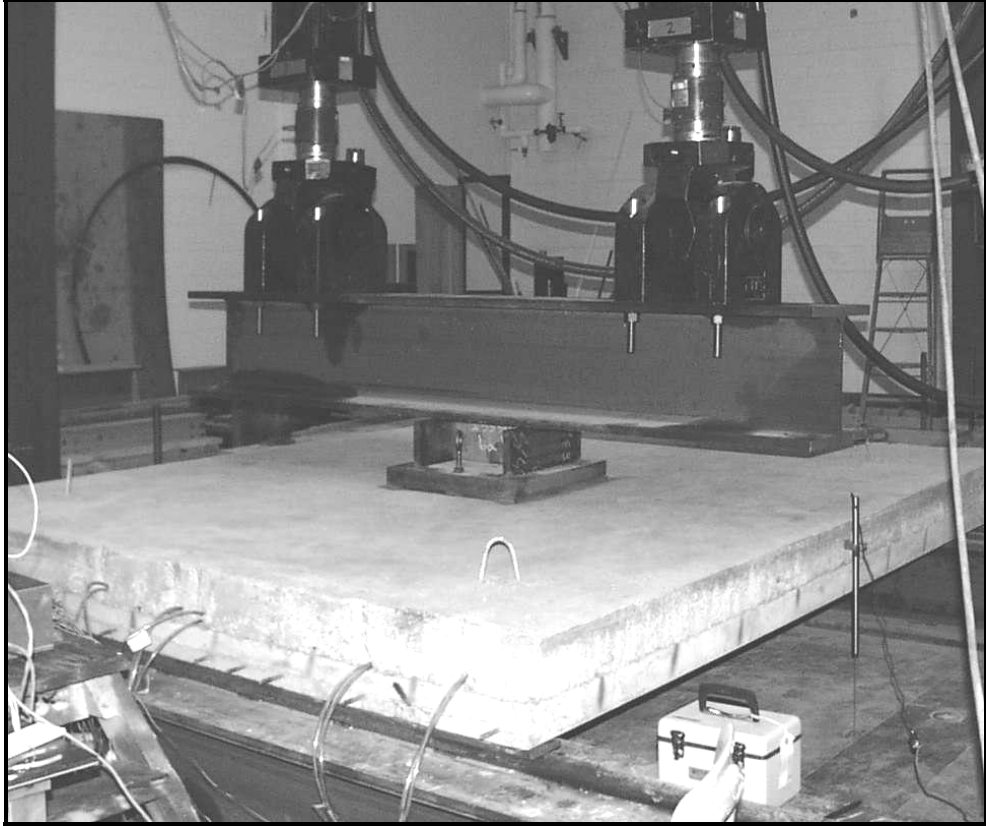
Plate Load Testing Setup for Composite Slab Tests
